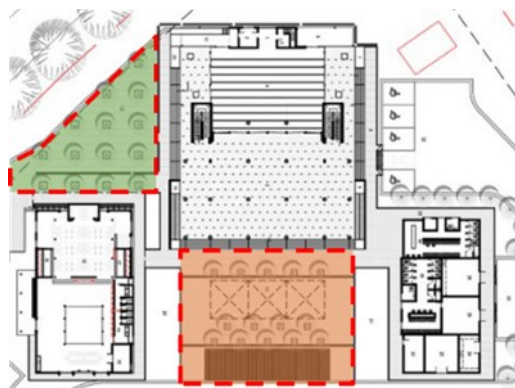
A floor plan that shows a Sahn through plan composition [30]
